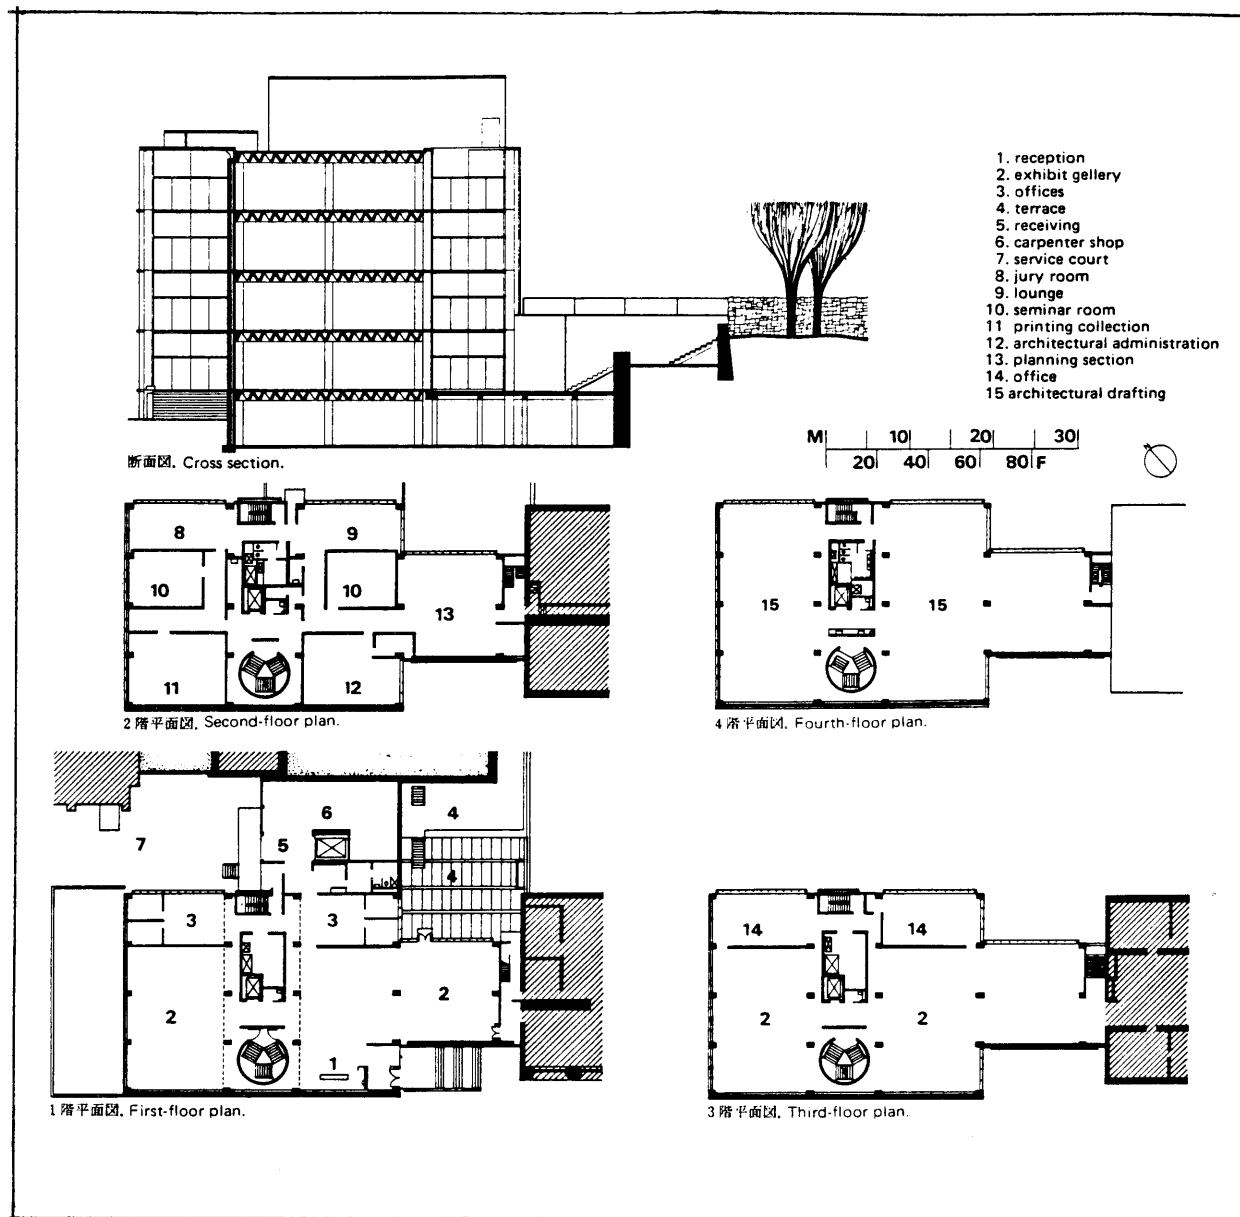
Plan of Yale Art Gallery, New Haven. Kahn. 1951
